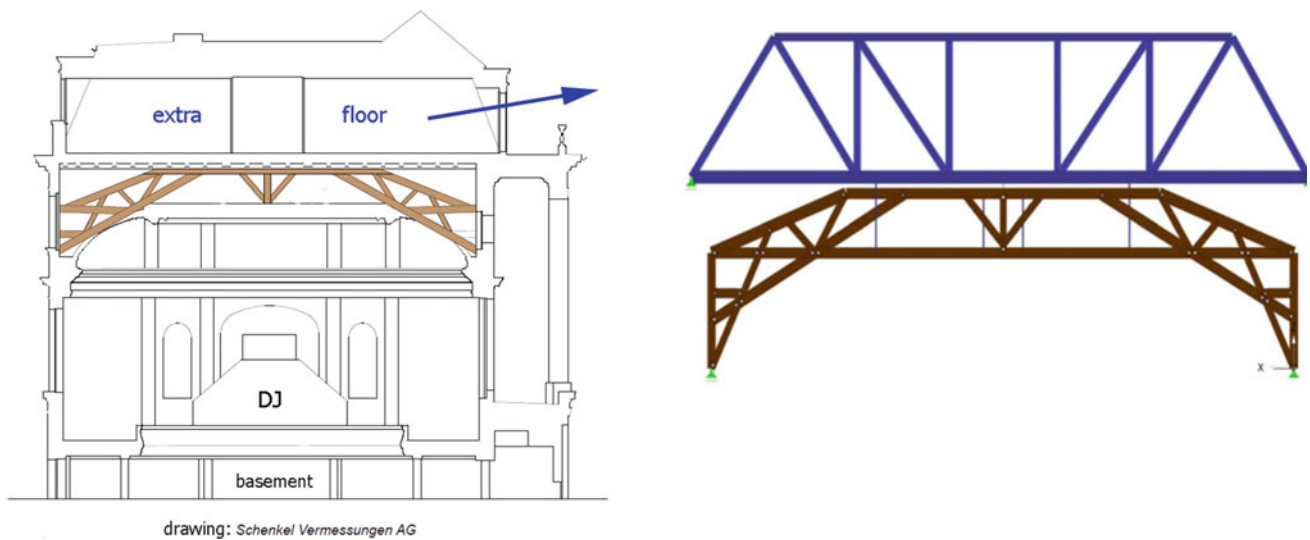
The Casineum roof construction as of today ([1]). Brown: remaining part of the original timber truss. Blue: steel truss (new extra floor). Brown timber truss today's function: transfer the roof load from plastered reed to steel hangers. Thin blue vertical lines: steel hangers transferring the global loads from timber to steel
